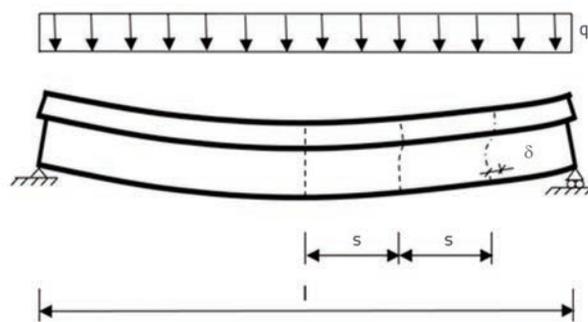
Concrete slab and timber beam composite structure with flexible connectors
